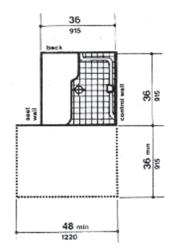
Shower Size and Clearances 36-in by 36-in (760mm by 1525mm) Stall
